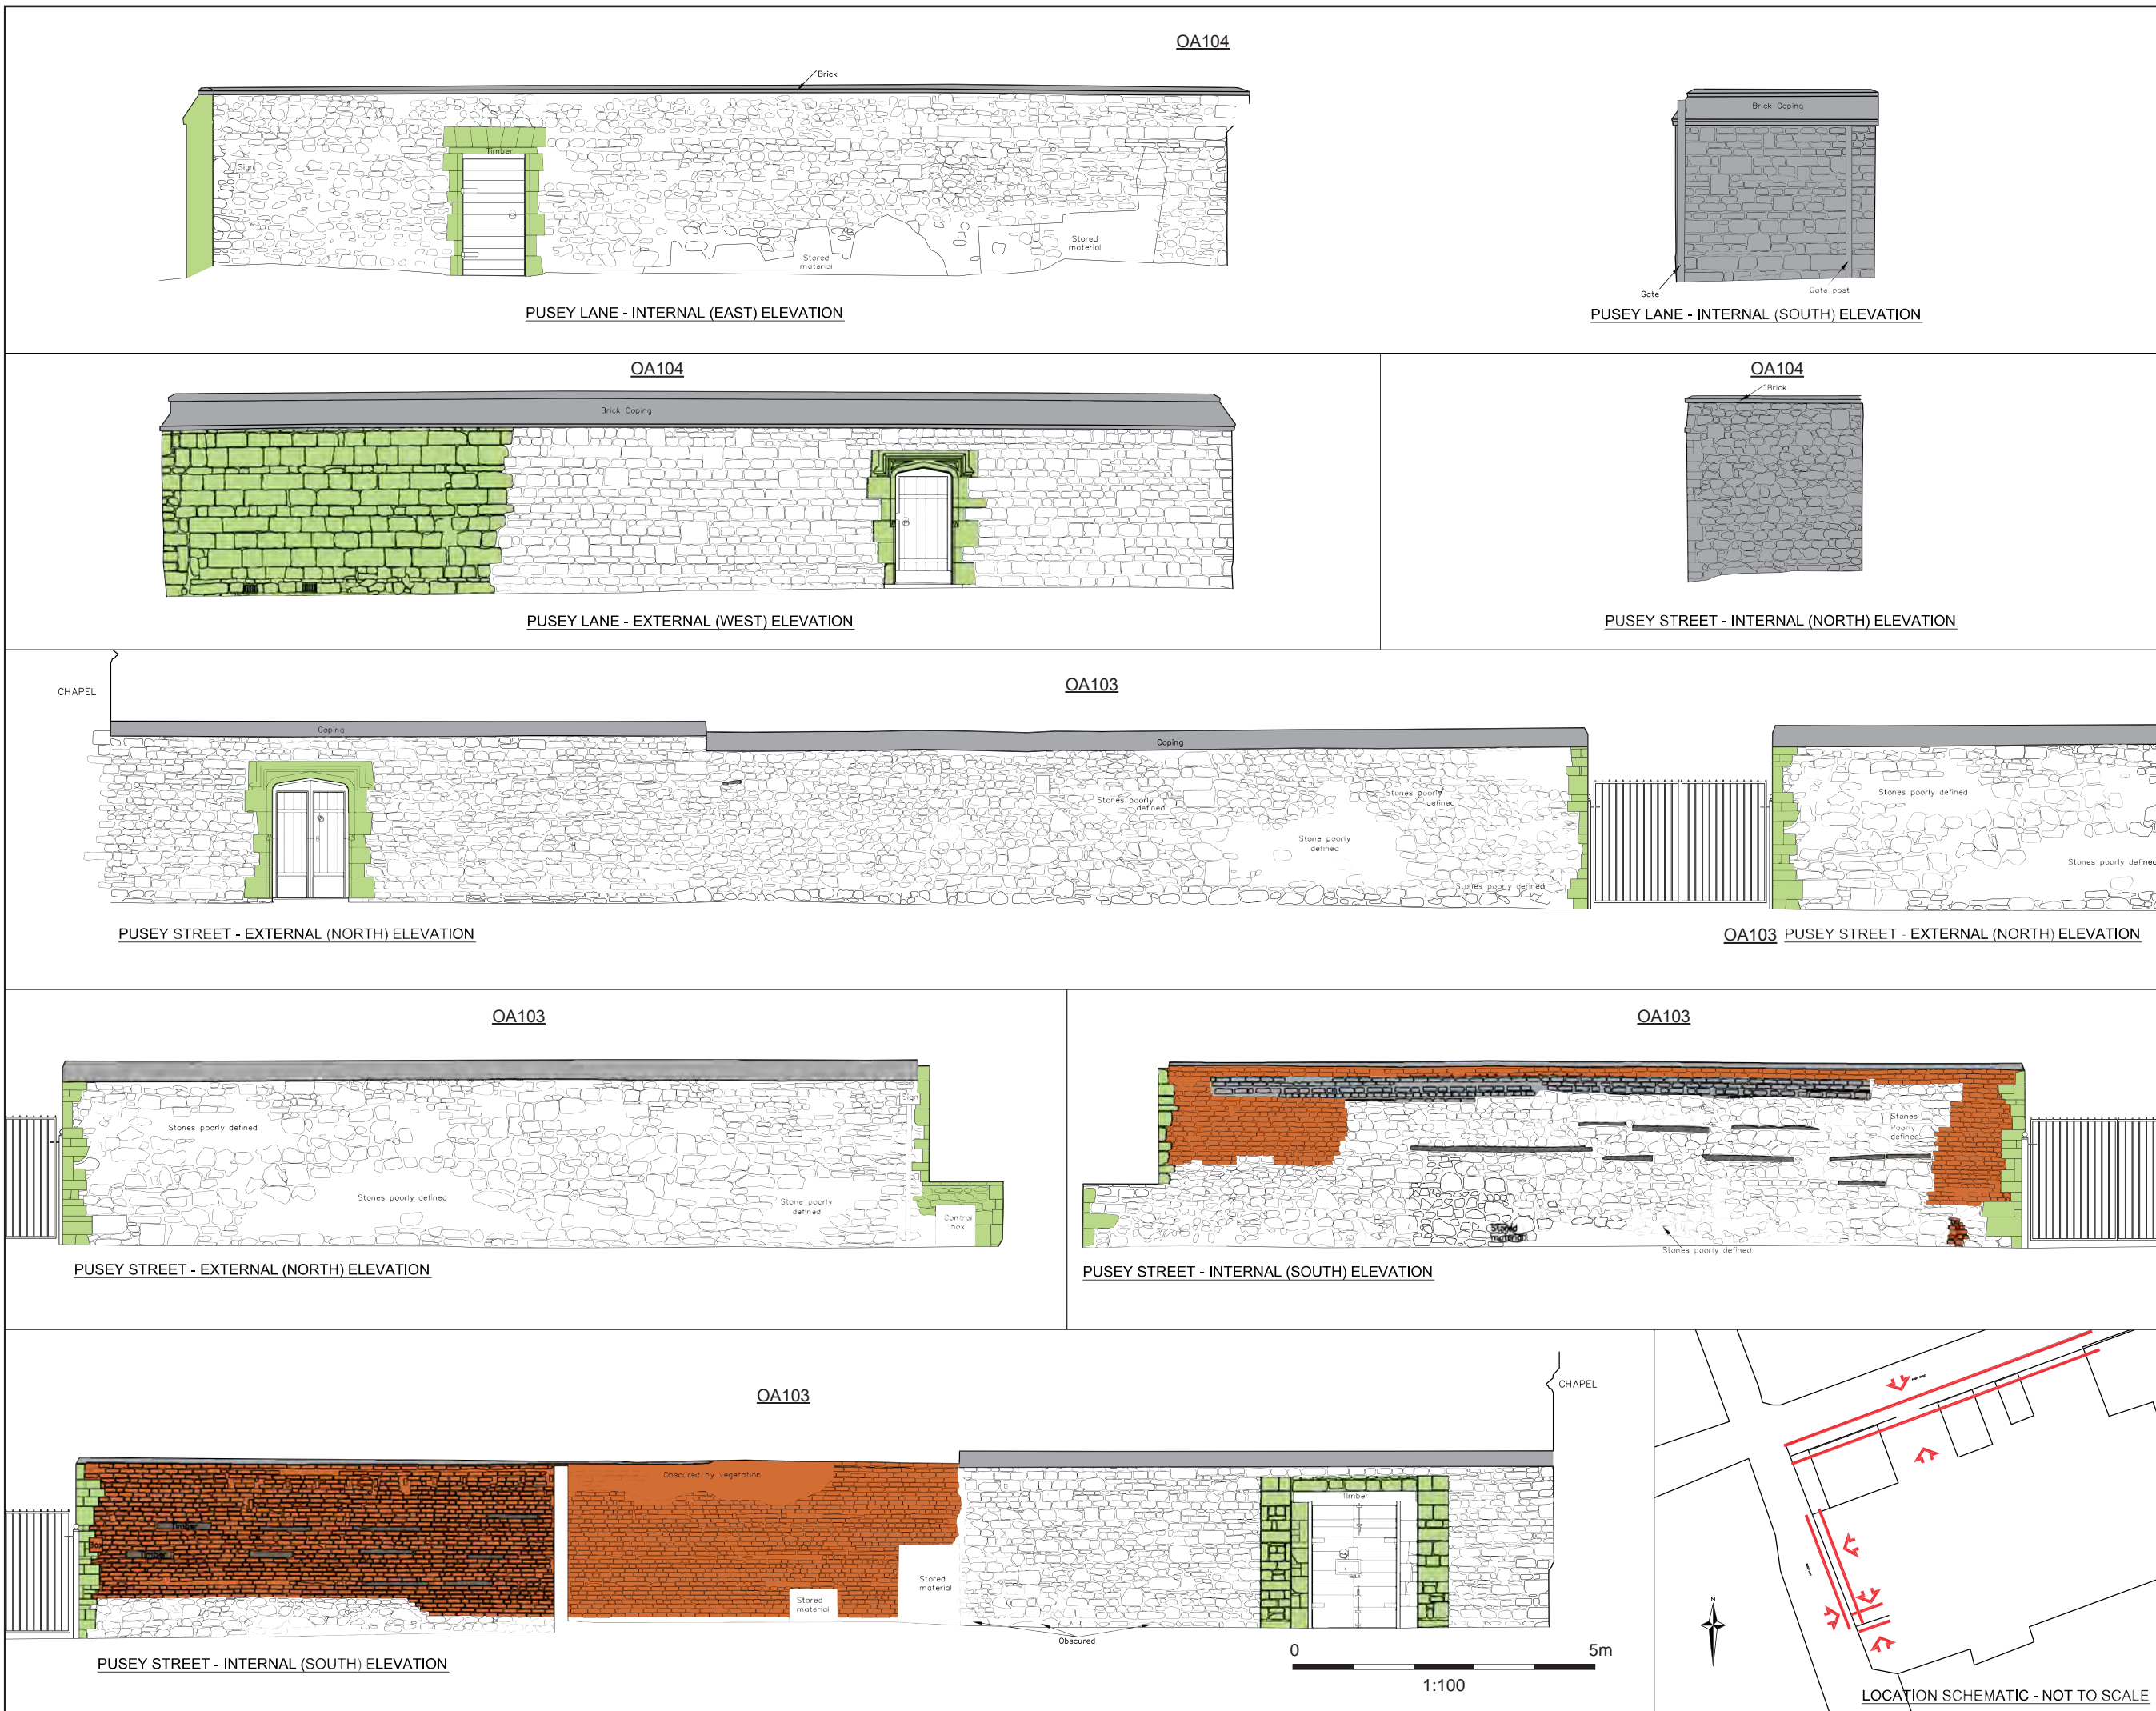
Pusey Street (OA103) and Pusey Lane (OA104) boundary wall elevations
